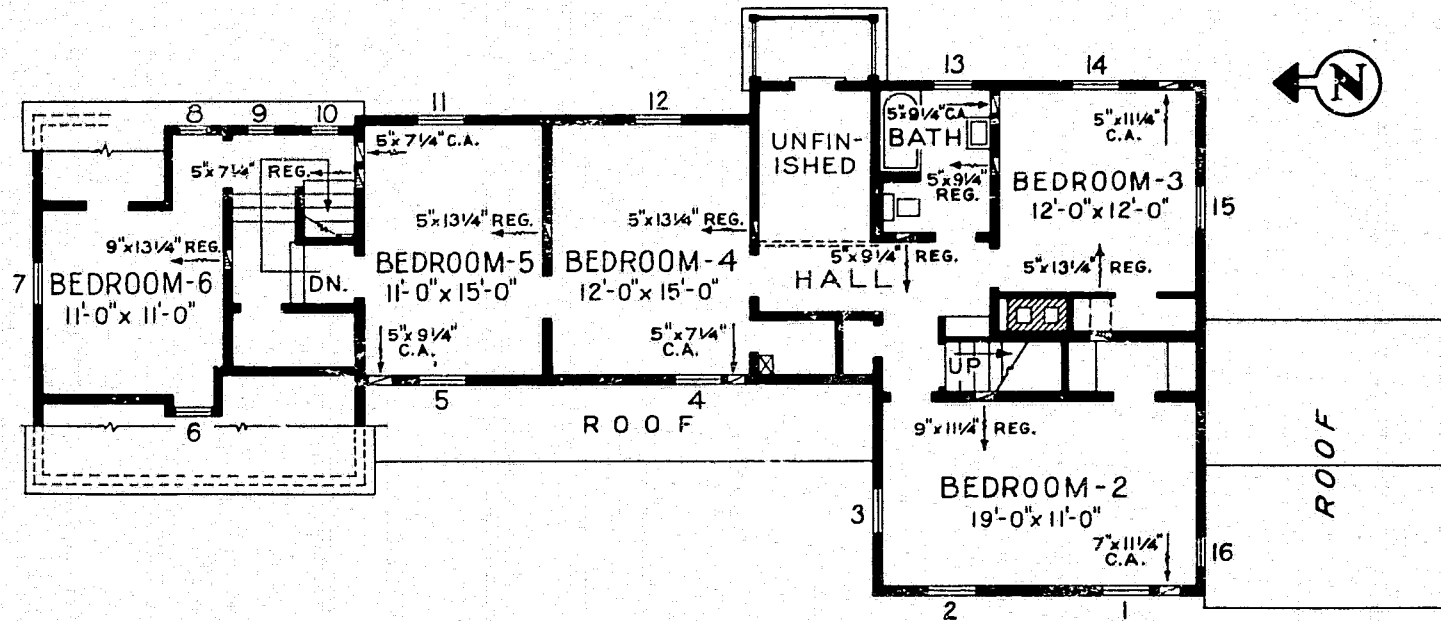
Second-floor plan of house No. 7-R, showing location of warm-air registers and cold-air returns.
